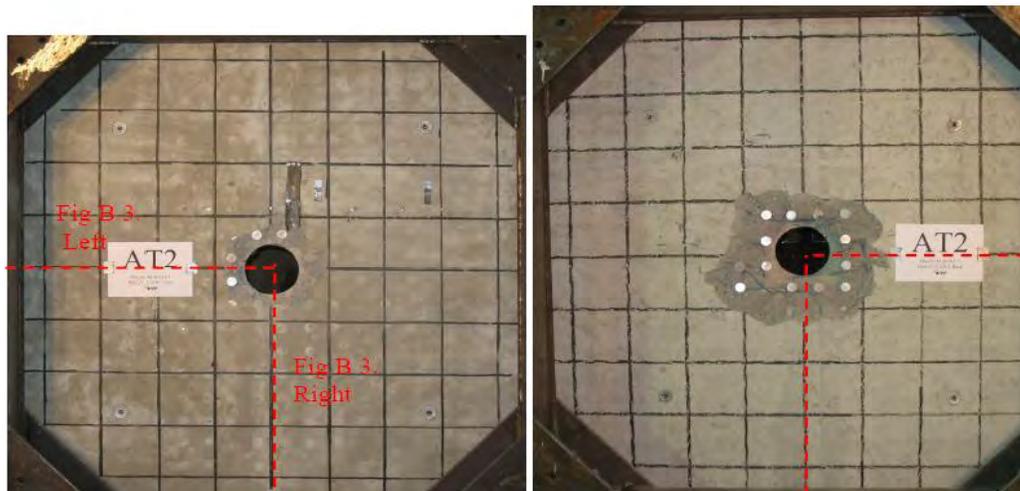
Test specimen with T-headed bars after the test (left-front face, right-rear face)
